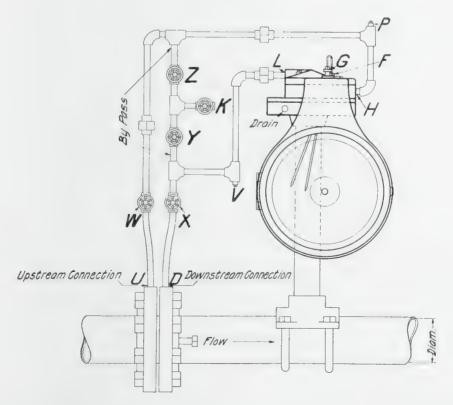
10 OR 20 INCH GAUGE INSTALLATION FOR MEASURING GAS OR AIR, FLANGE CONNECTIONS
